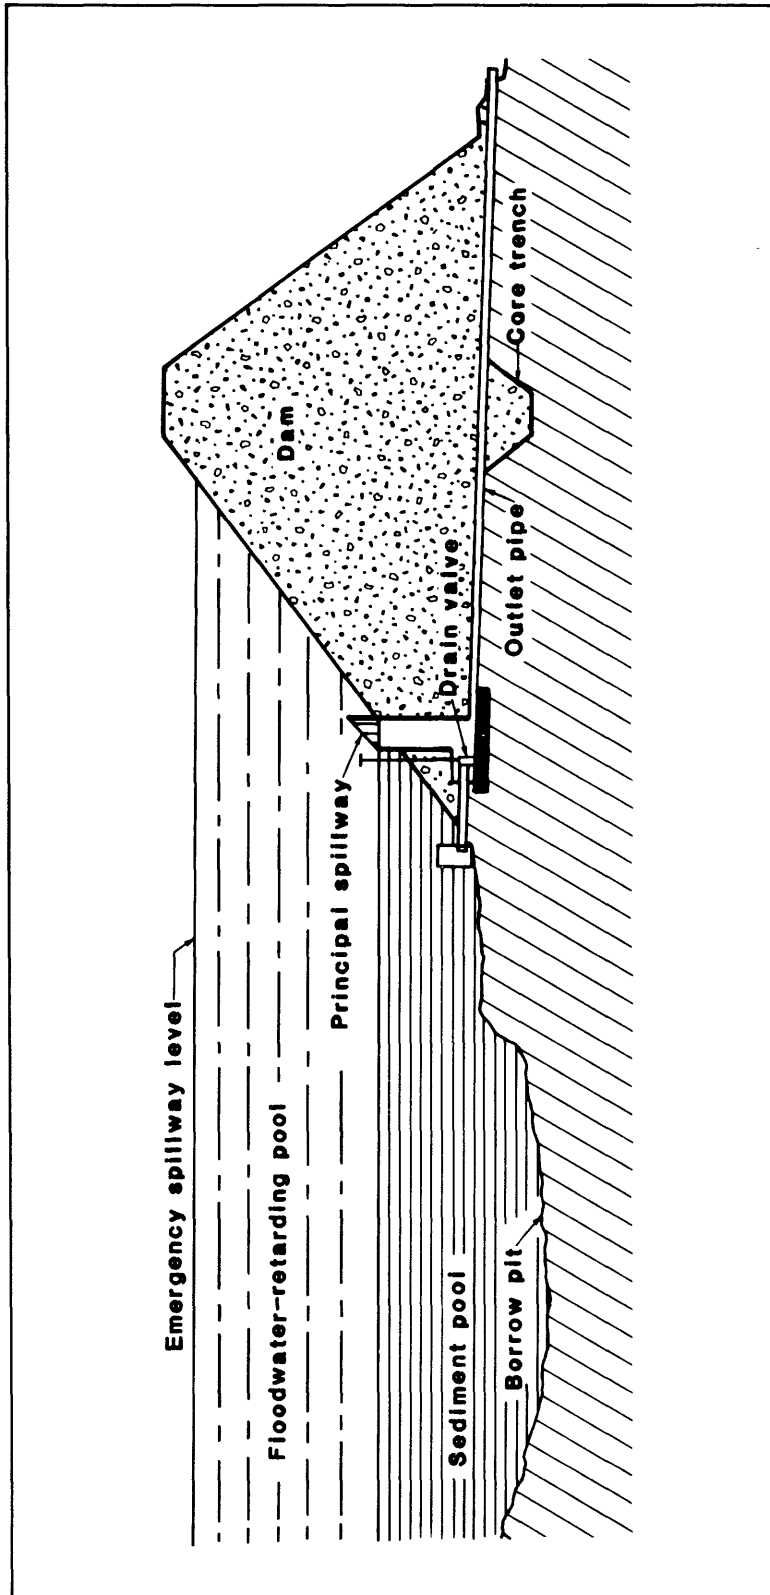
Cross section of typical floodwater retarding structure (Gilbert and Sauer, 1970).
